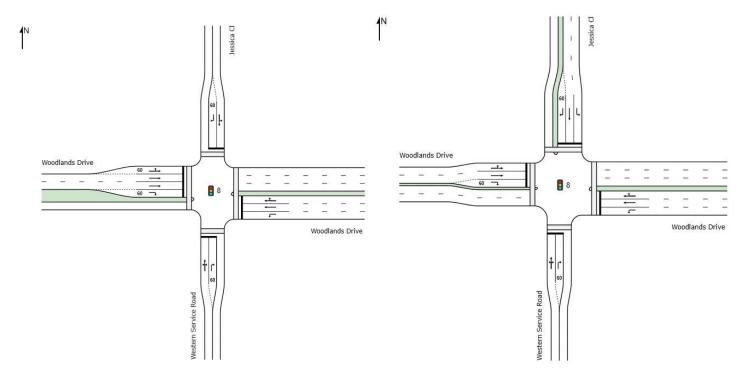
Western service Road/Jessica Close & Woodlands Drive – Intersection 8 layout - Before Construction and During Construction
